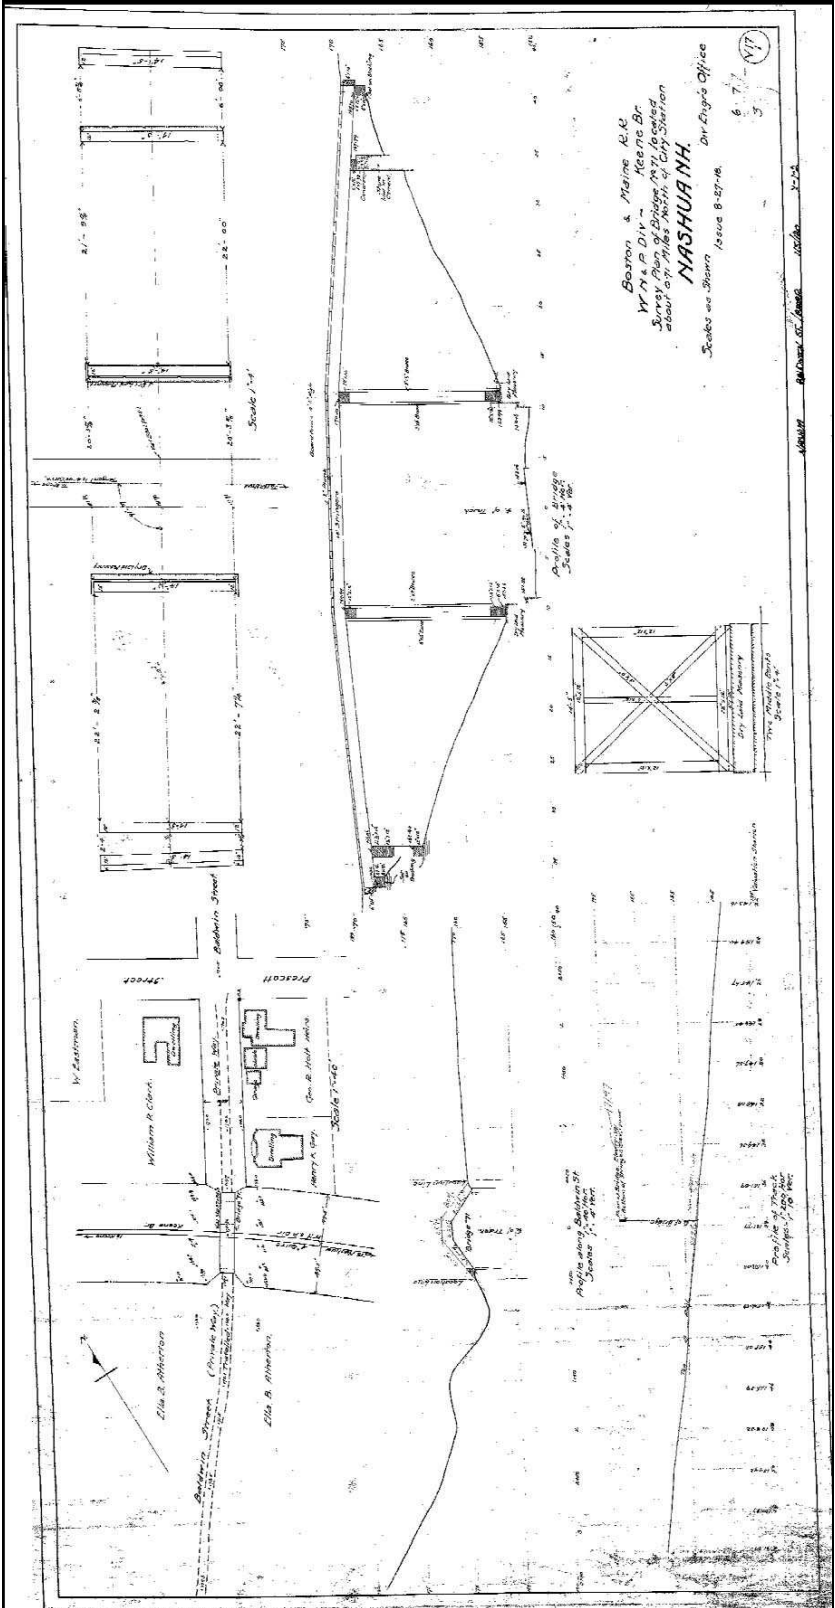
Baldwin Street Bridge, "Survey Plan," dated 8/27/1918 (Boston and Maine Railroad Plans, 1918).
